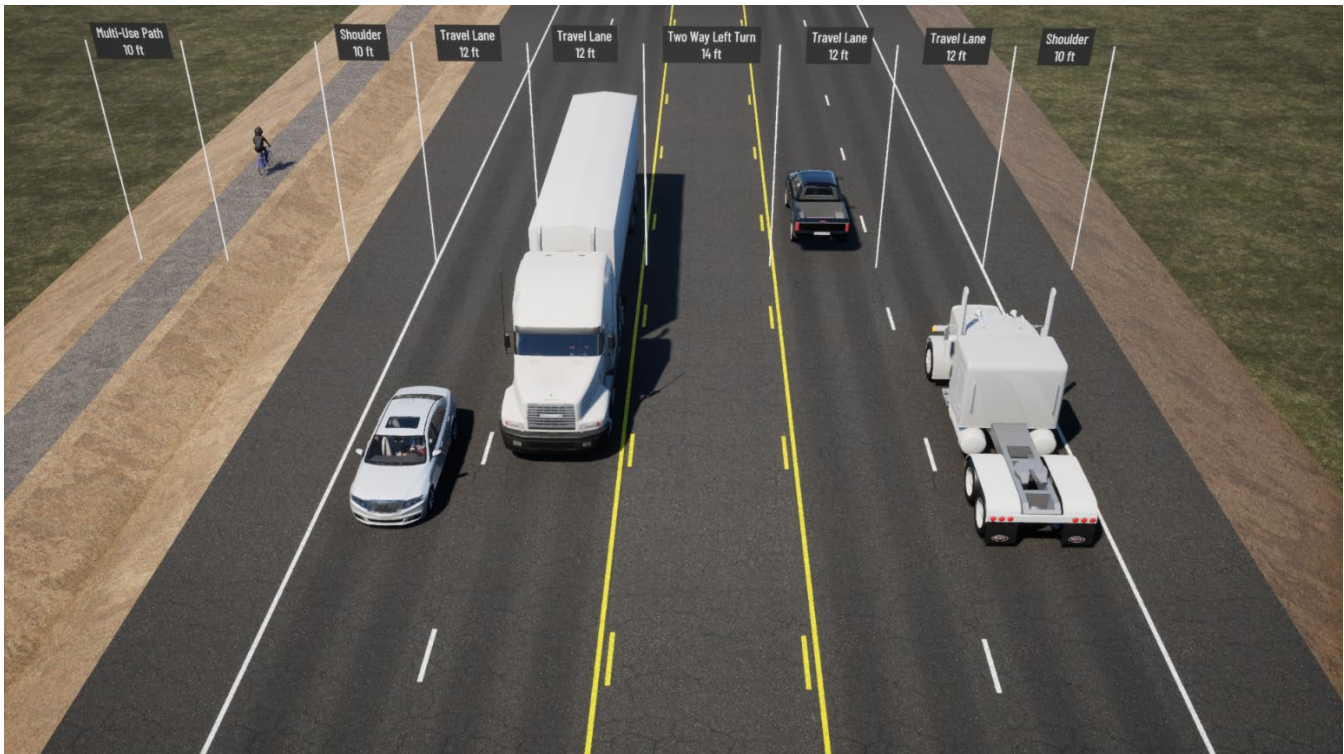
Proposed lane configuration for Meridian Road extension
